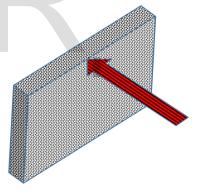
Wall bent about its minor axis (Out-of-plane bending).
